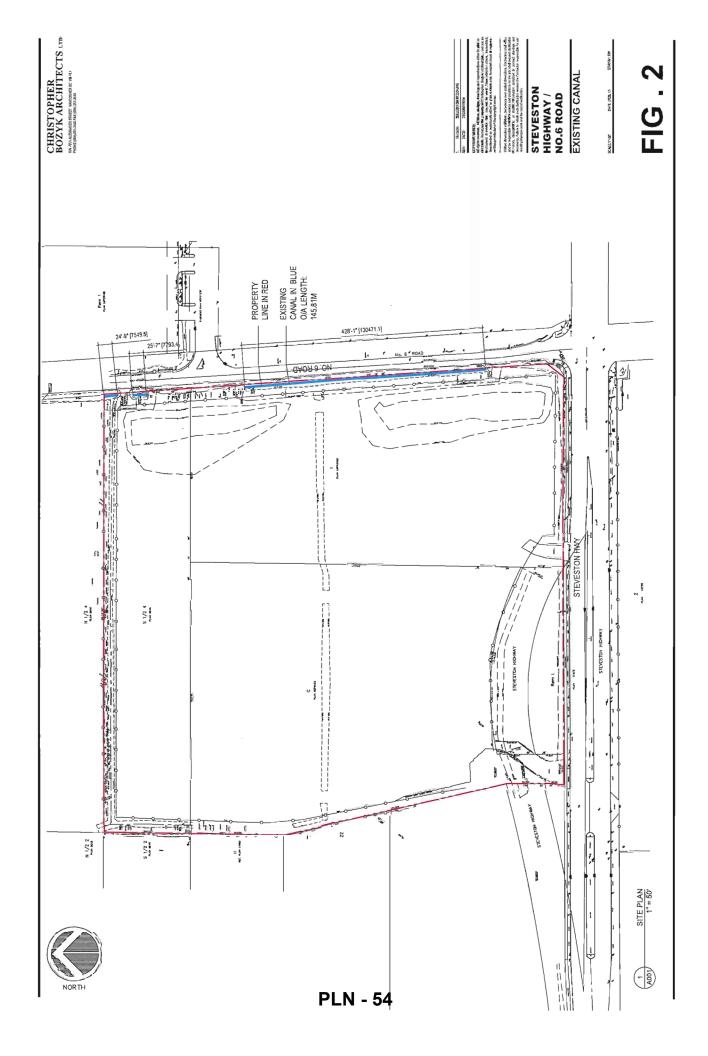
Existing RMA at Ledcor property at Steveston Highway and No. 6 Road
